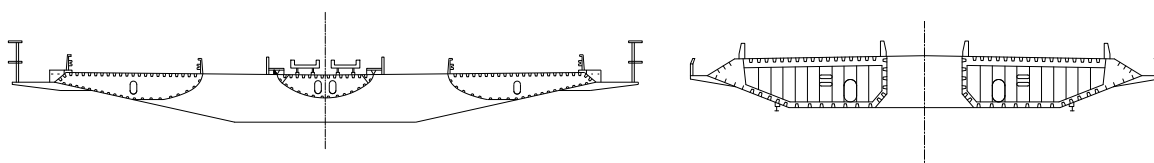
Deck section of Messina Bridge (left) and Xihoumen Bridge (right)
